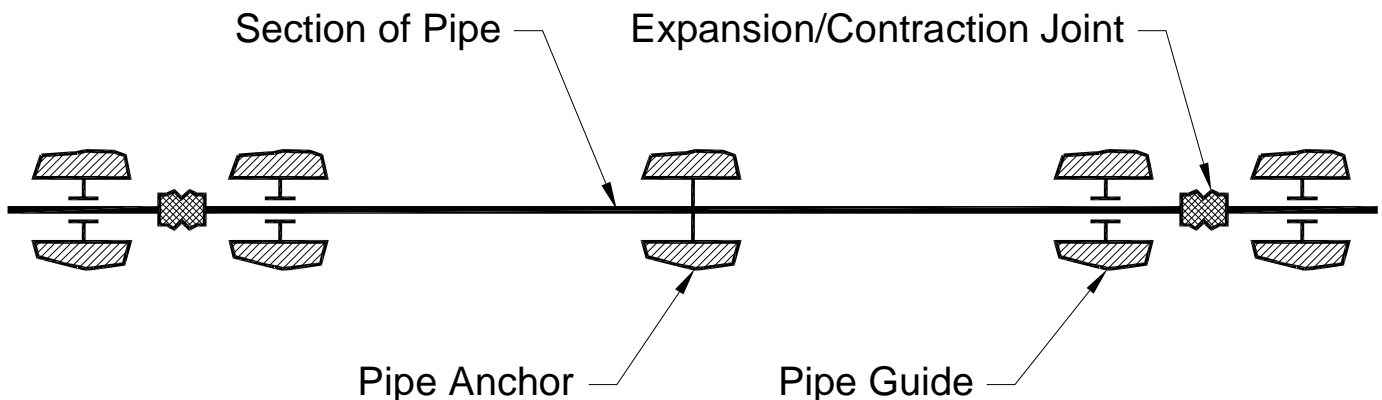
; Typical Section of Extreme Temperature Piping – Center Anchor
